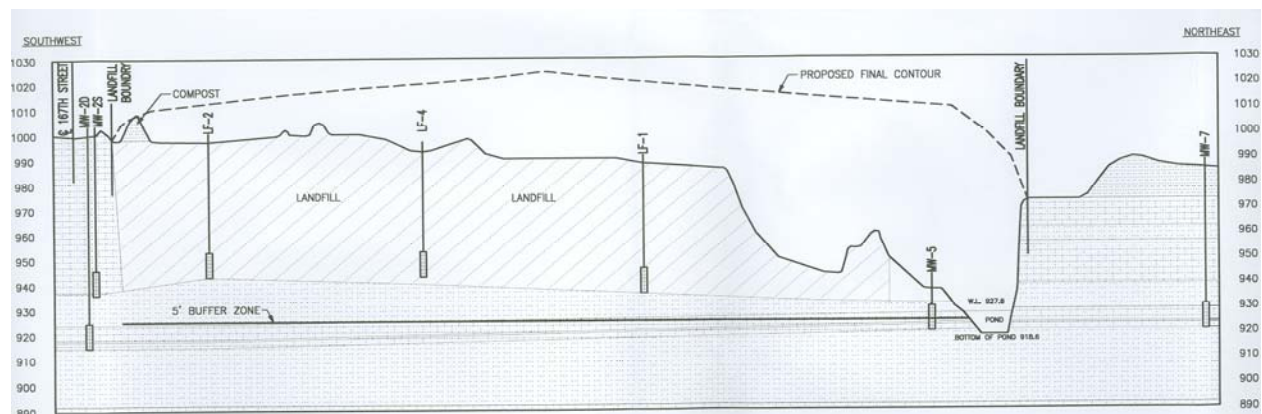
Cross-section of landfill showing requested 1024-foot final-cap elevation.
